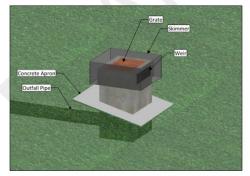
Typical Dry Retention Pond Control Structure – Isometric View (Not to scale)
